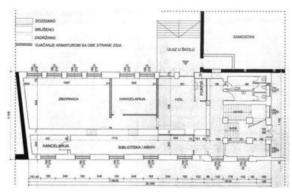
Convent of Sisters of Mercy of Saint Vincent De Paul, Gymnasium building; floor plan of reconstructed building. [12:190]
